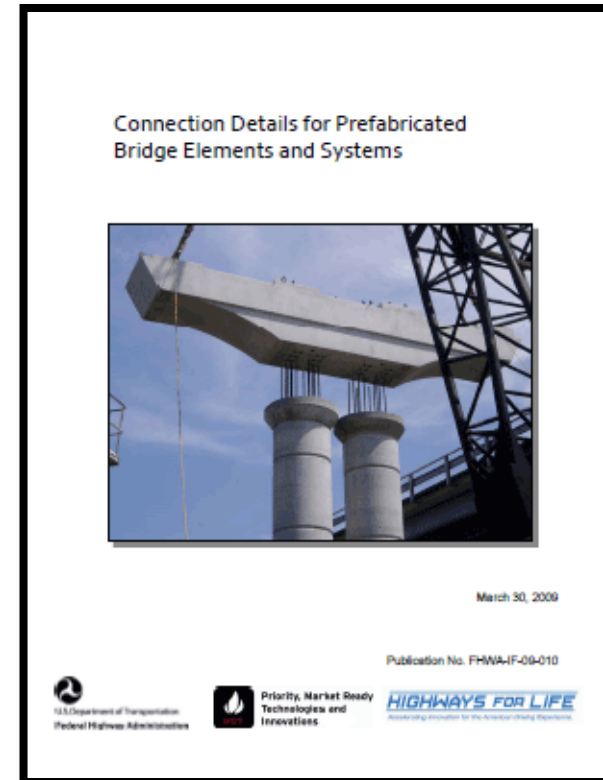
Manual for Connection Details for Prefabricated Bridge Elements and Systems (www.super-slab.com)
